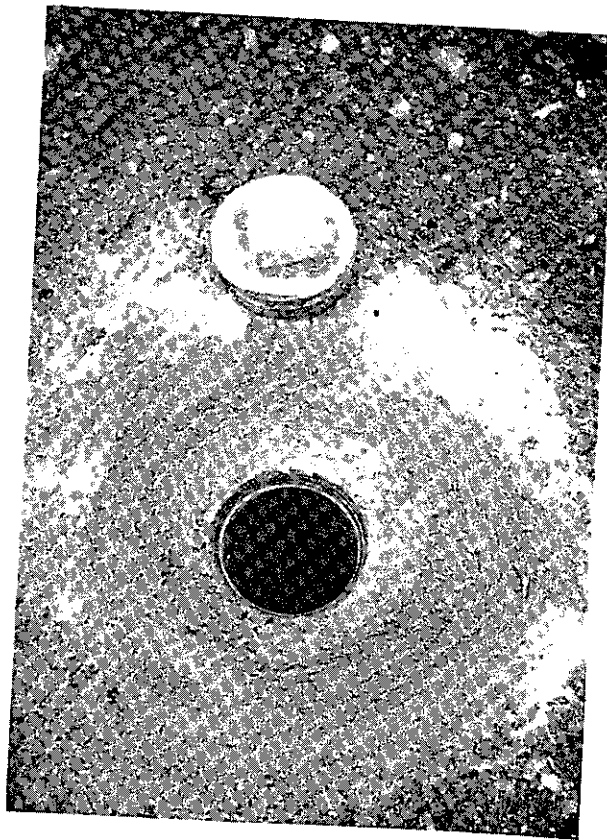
Shows appearance of a completed observation well; upper part of hole has been sealed with a fast setting sand-cement grout.
